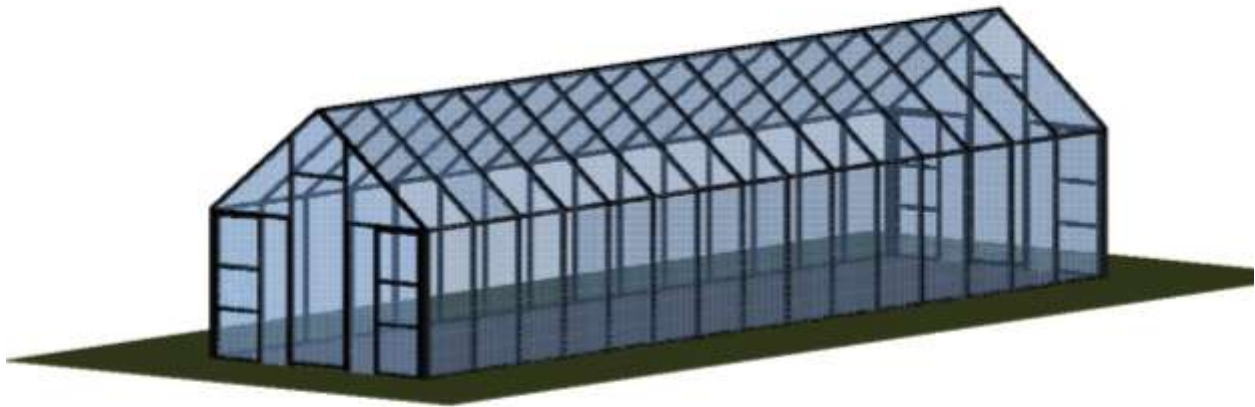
Sketch of traditional greenhouse structure, individual installation
